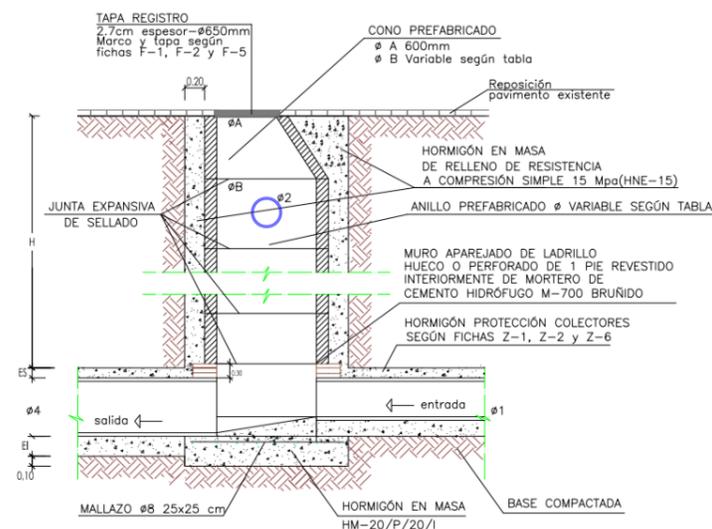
Prefabricated manhole type elevation. Source: Ayuntamiento de Valencia, 2015
